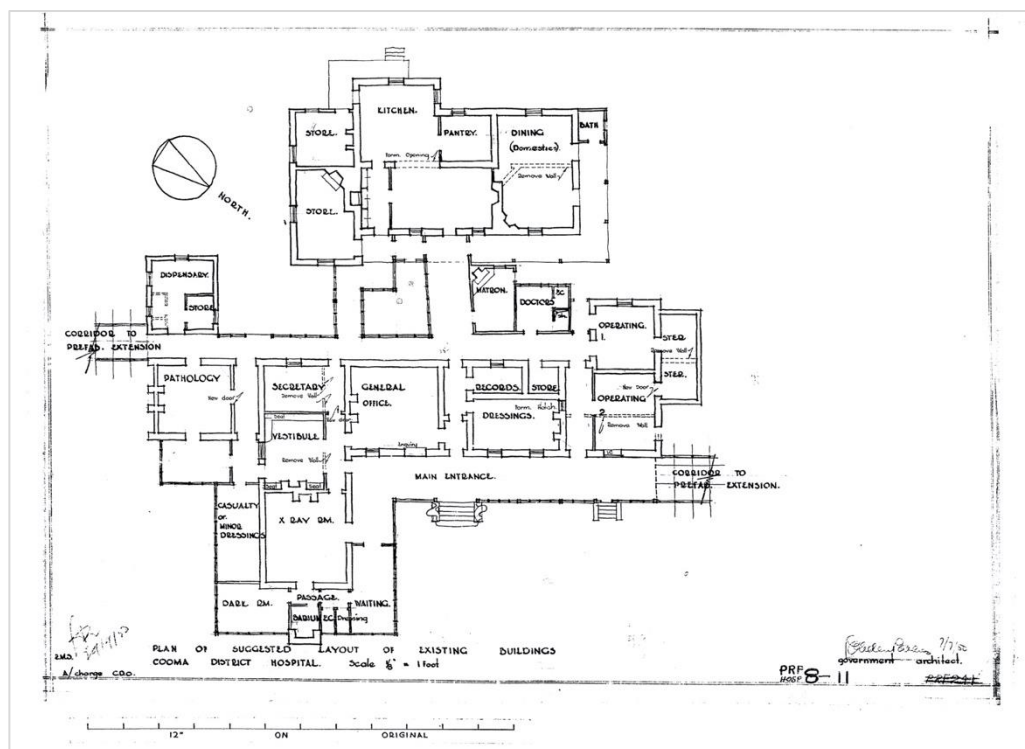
"Plan of suggested layout of existing buildings", signed by Government Architect Cobden Parkes on 7 July 1950, showing planned alterations to the hospital. These were likely not carried out as shown (Source: NSW Plan Services (PWA), PRF-PH8-11 – Cooma Hospital – Main Block – Plan)
